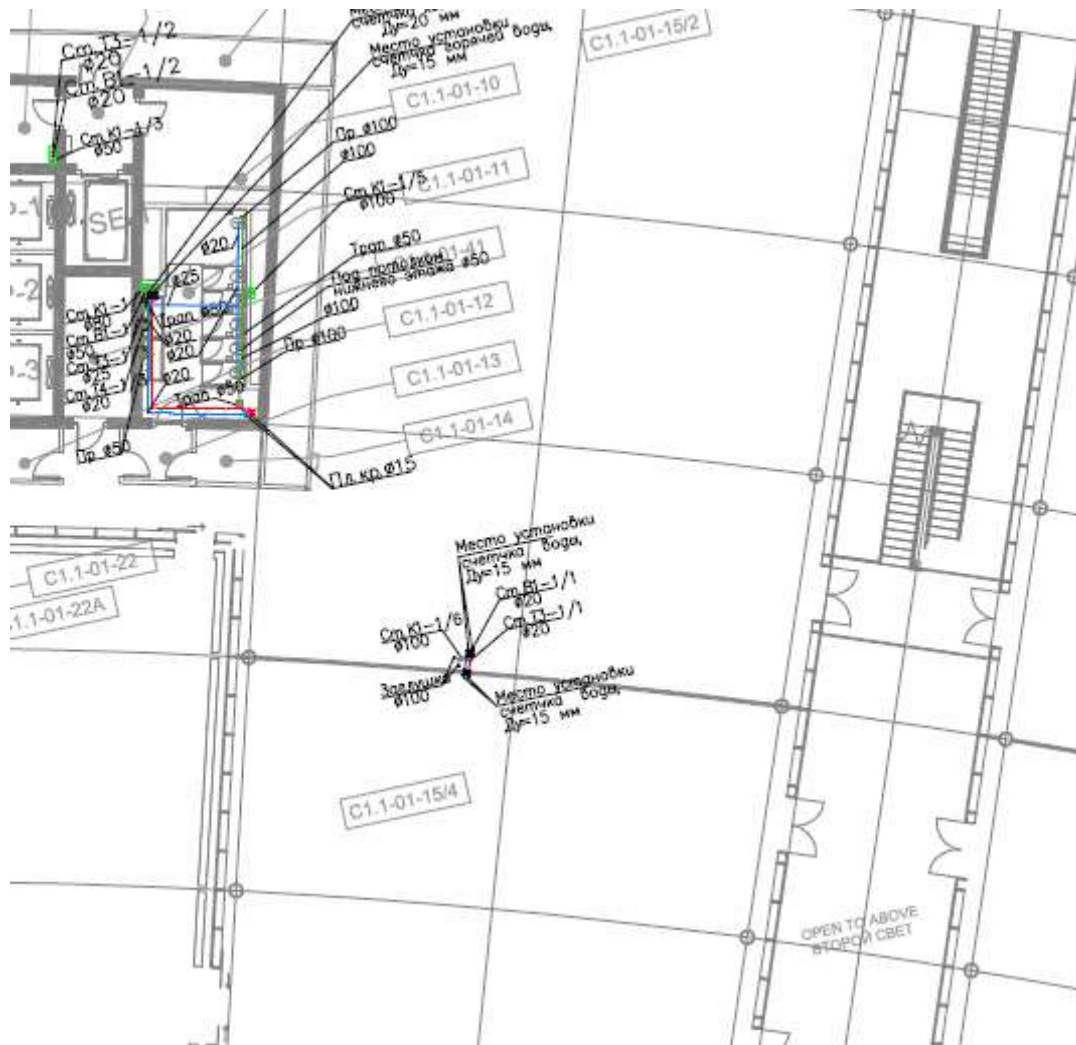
Plan showing the location of water supply entry point into the Official Participant's Pavilion.
